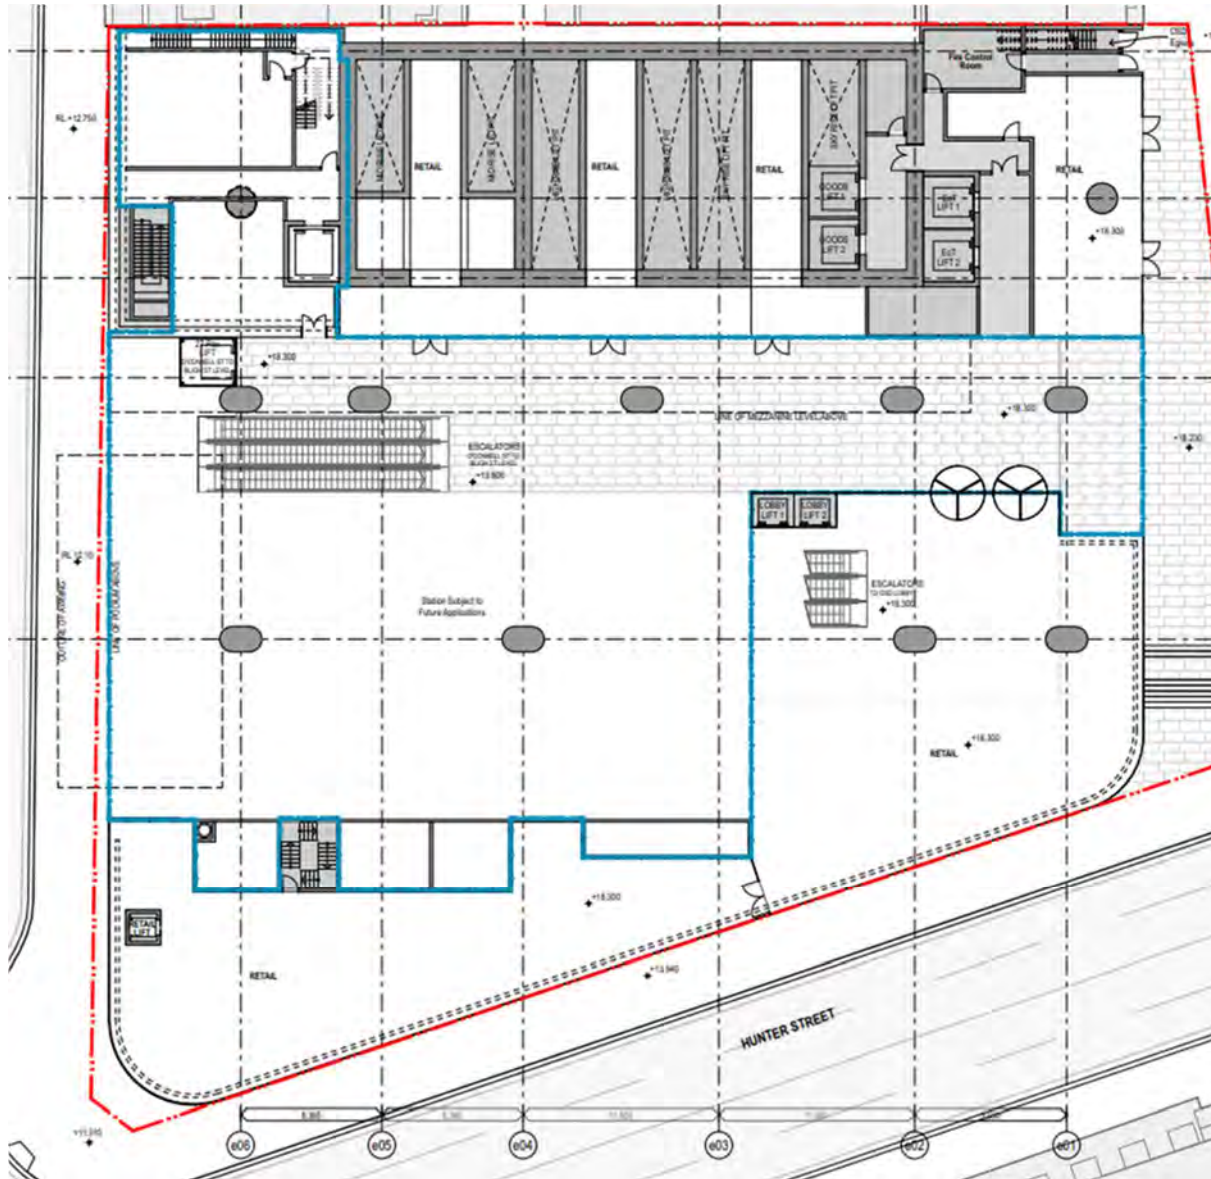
East Hunter St Station and OSD ingress locations at Bligh Street
